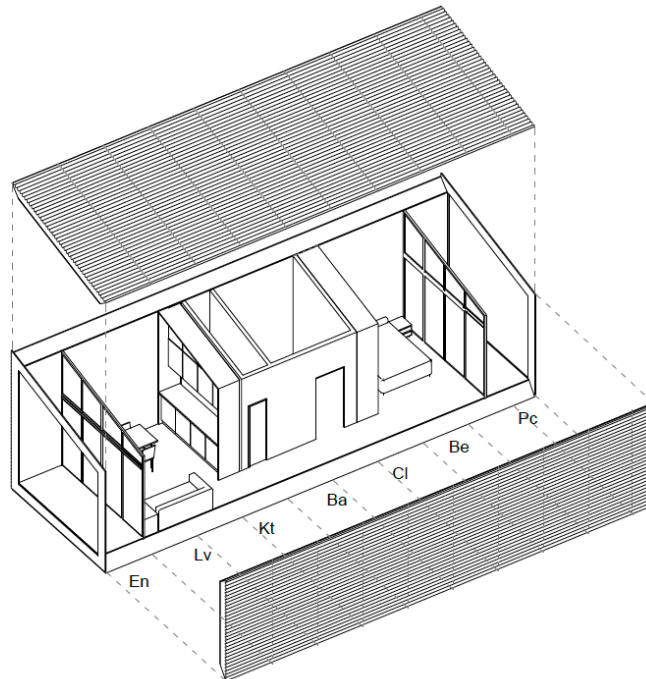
Mini-homes exploded axo with internal spaces (approximately 32 sqm)
